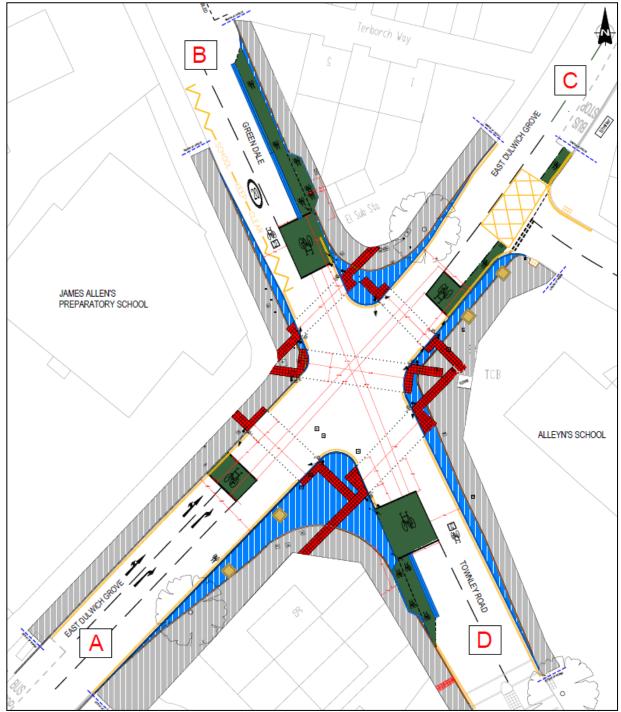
Figure E – Detailed Design Drawing of Option 7 No. D/EDG/CM/13/001/O7
